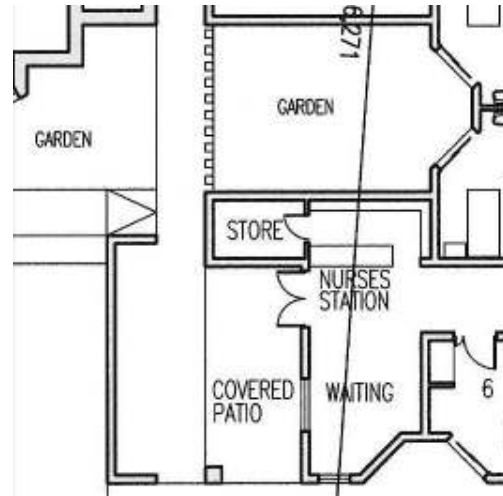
B – Floor Plan of the proposed Training Hospice for Sinikithemba
